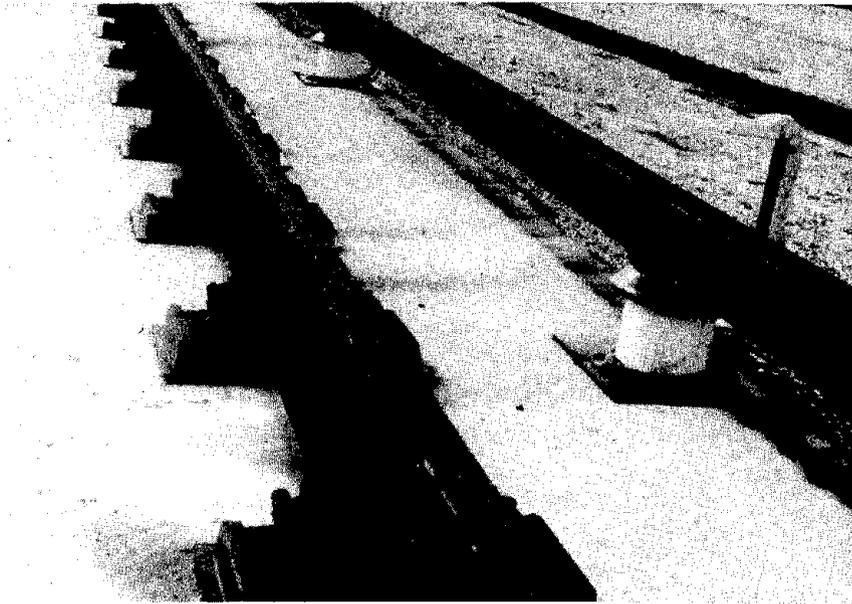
THIRD RAIL CHAIR ASSEMBLY SECURED TO SLAB
